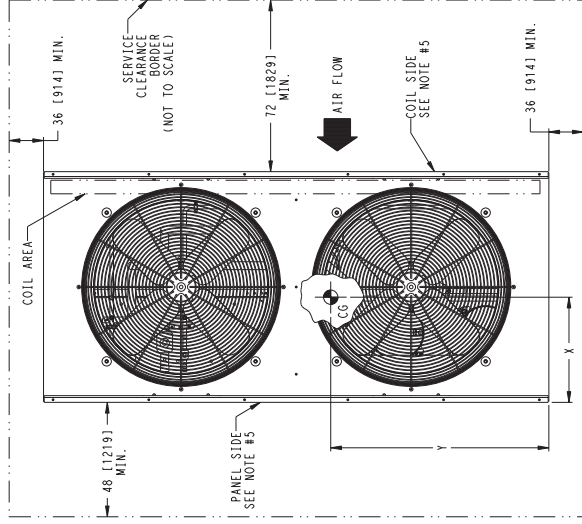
38AP Unit Dimensions, Sizes 025-030
